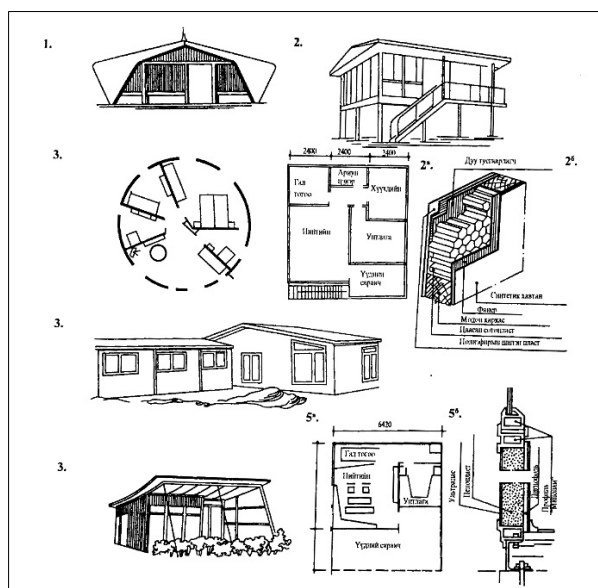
International case studies of prefabricated and portable dwelling 1-Germany 2-Italy 3-Italy 4-England 5-Germany a. Plan b. Cross section of wall [20]
